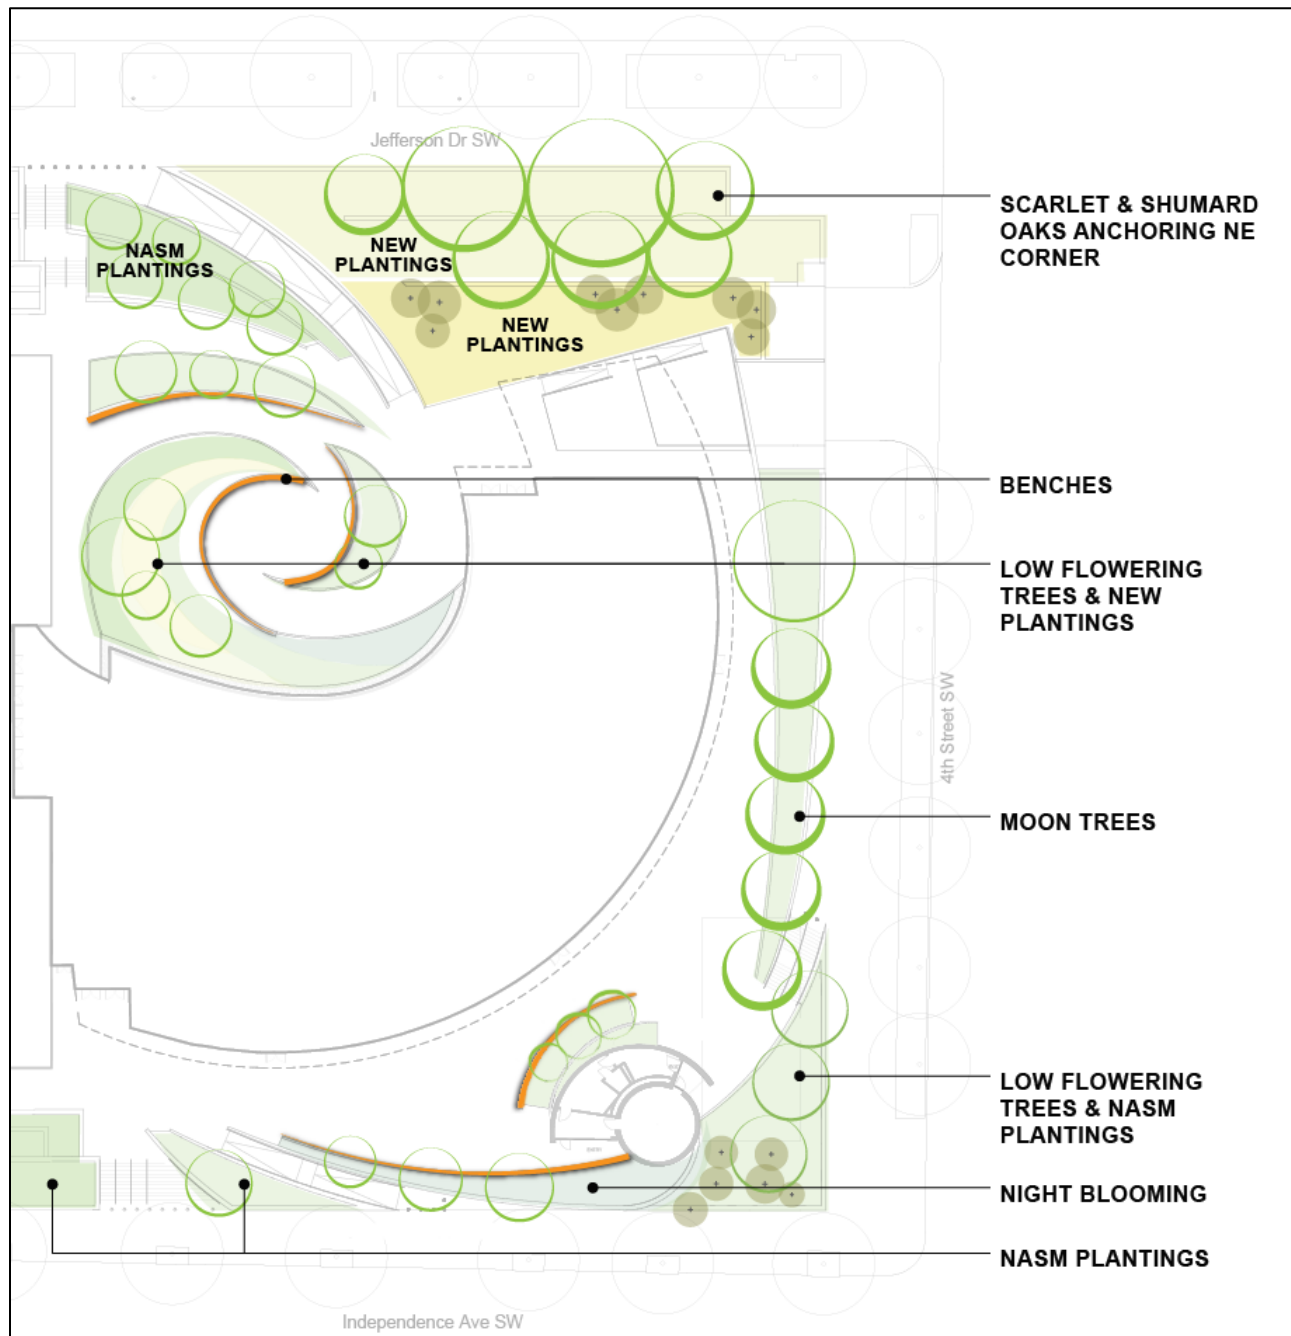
Proposed landscape plan that emphasizes the spiral design concept of the new addition. (Elizabeth Kennedy Landscape Architects, 2024)
